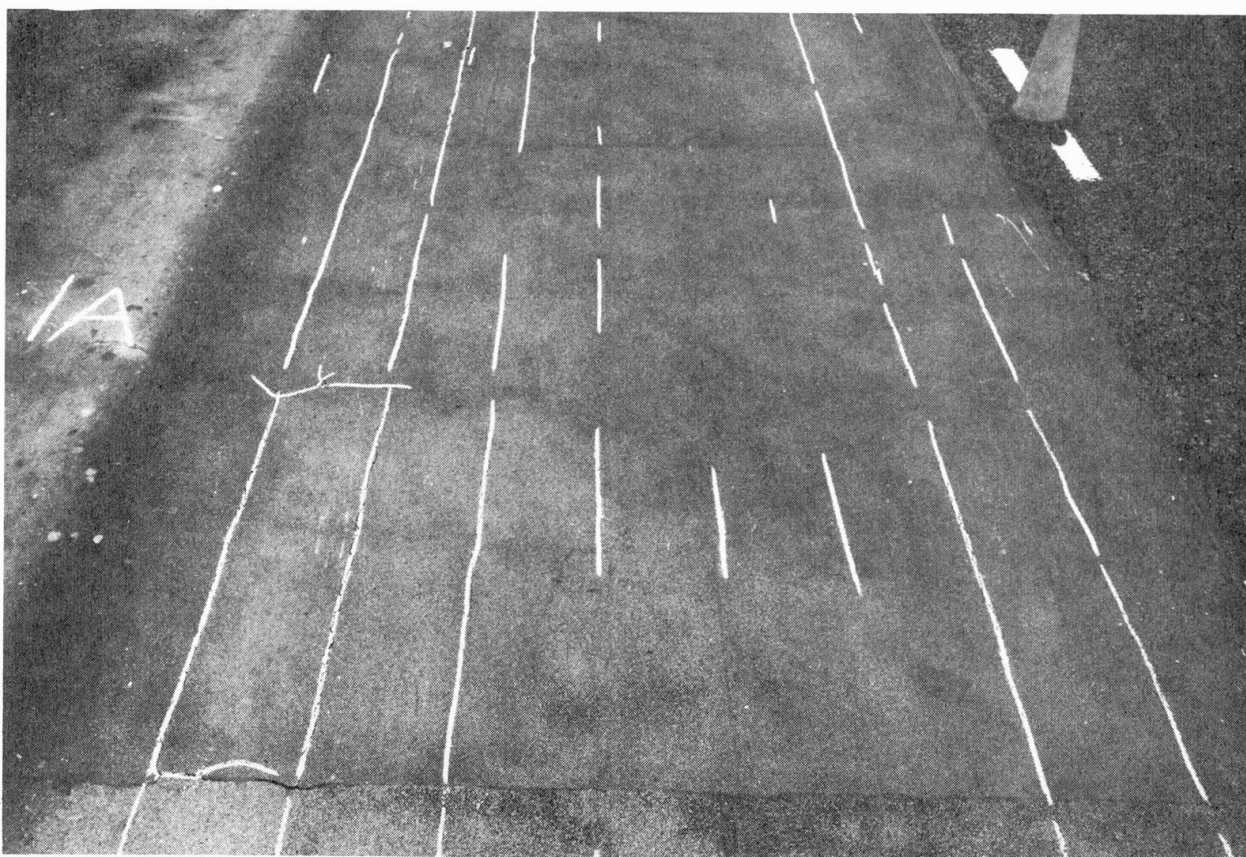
CRACKING IN EPOXY RESIN SURFACING ON SECTION 1A, NOVEMBER, 1967
